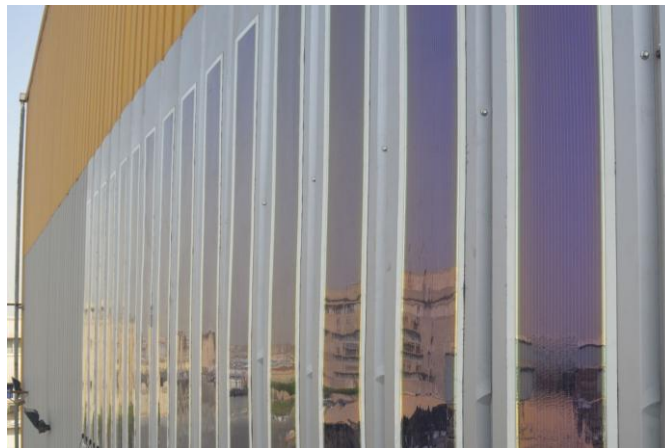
Project of OPVs integration on steel and concrete in a new building in Egypt
